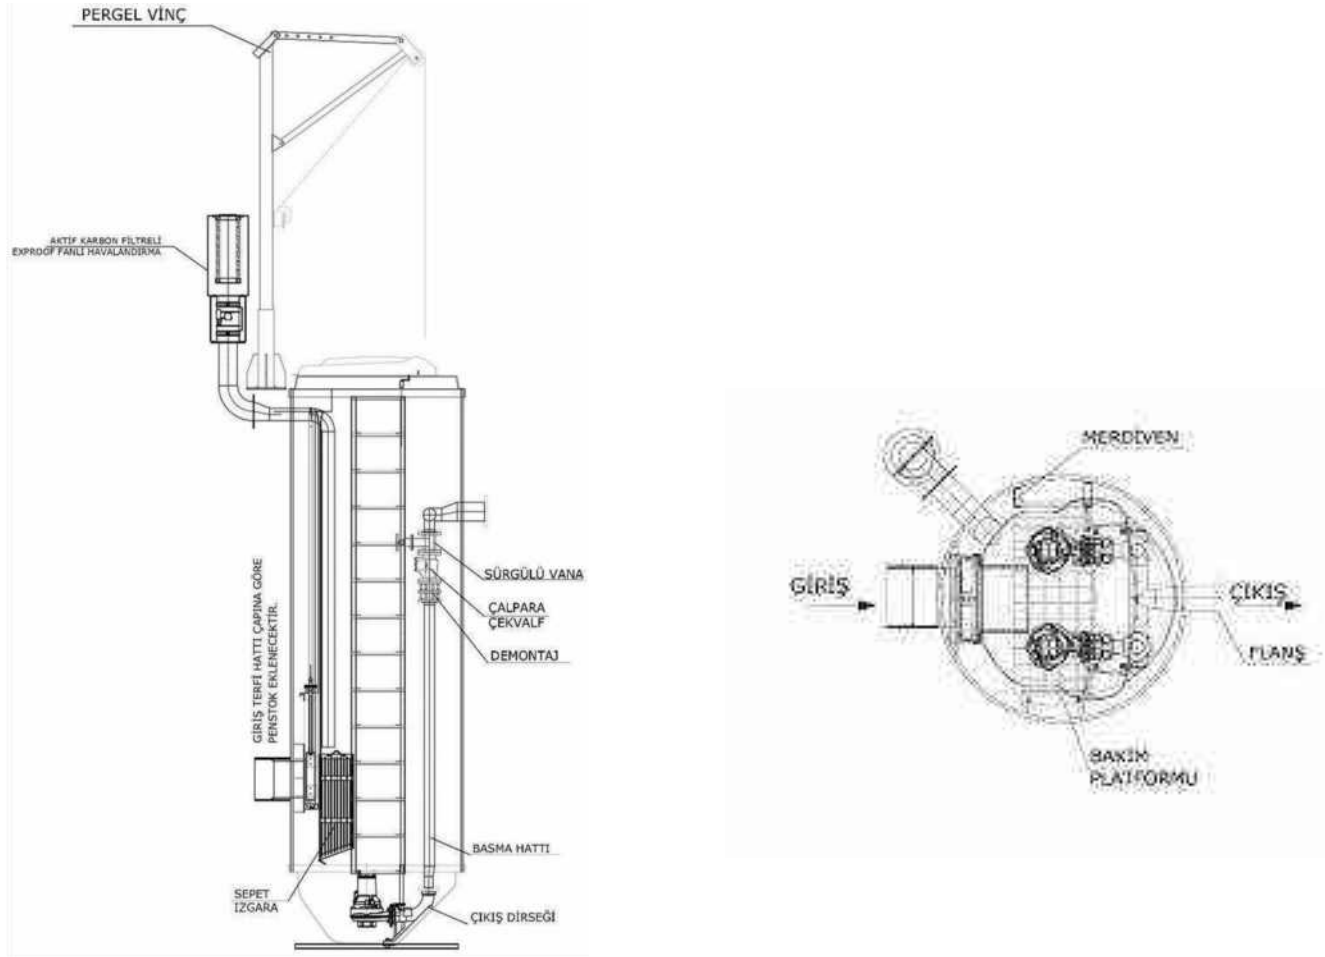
Package Type Pumping Station (without valve chamber)-Side View and Top View
